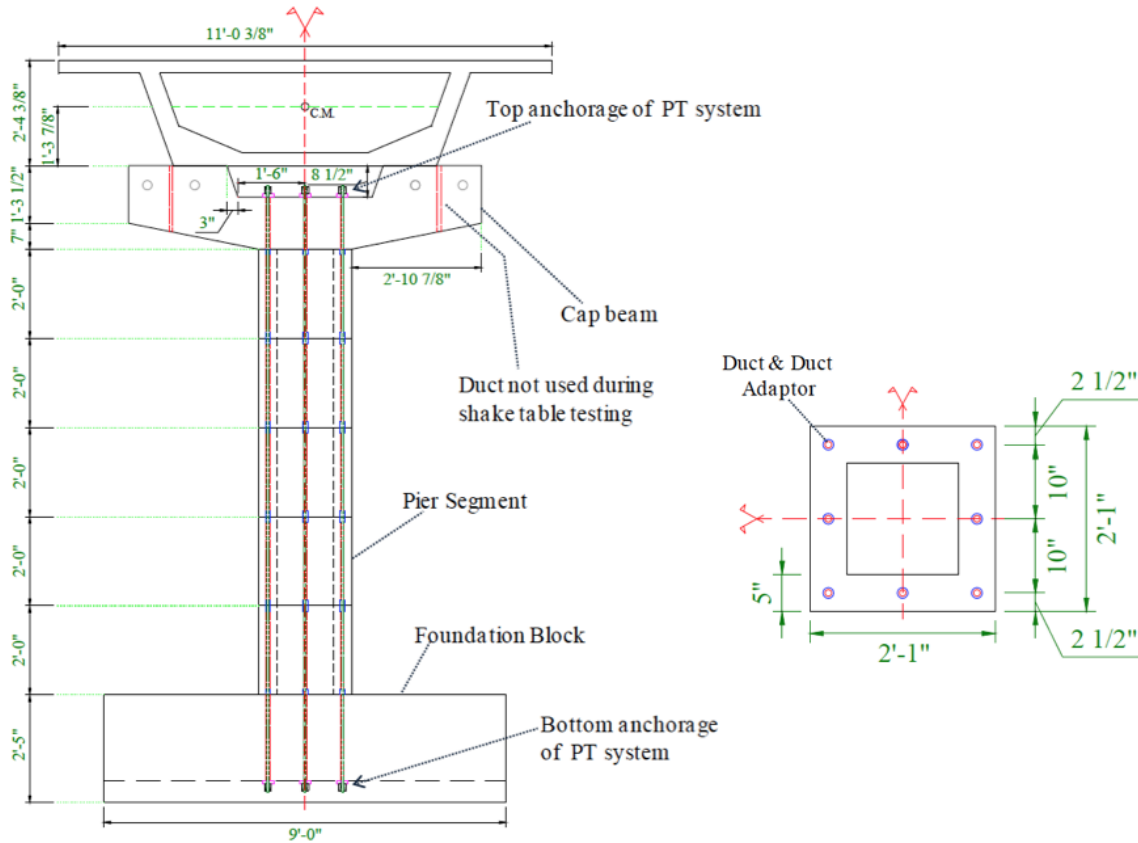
Elevation view of specimen structure and cross section of bridge pier, (Sideris, 2012)
